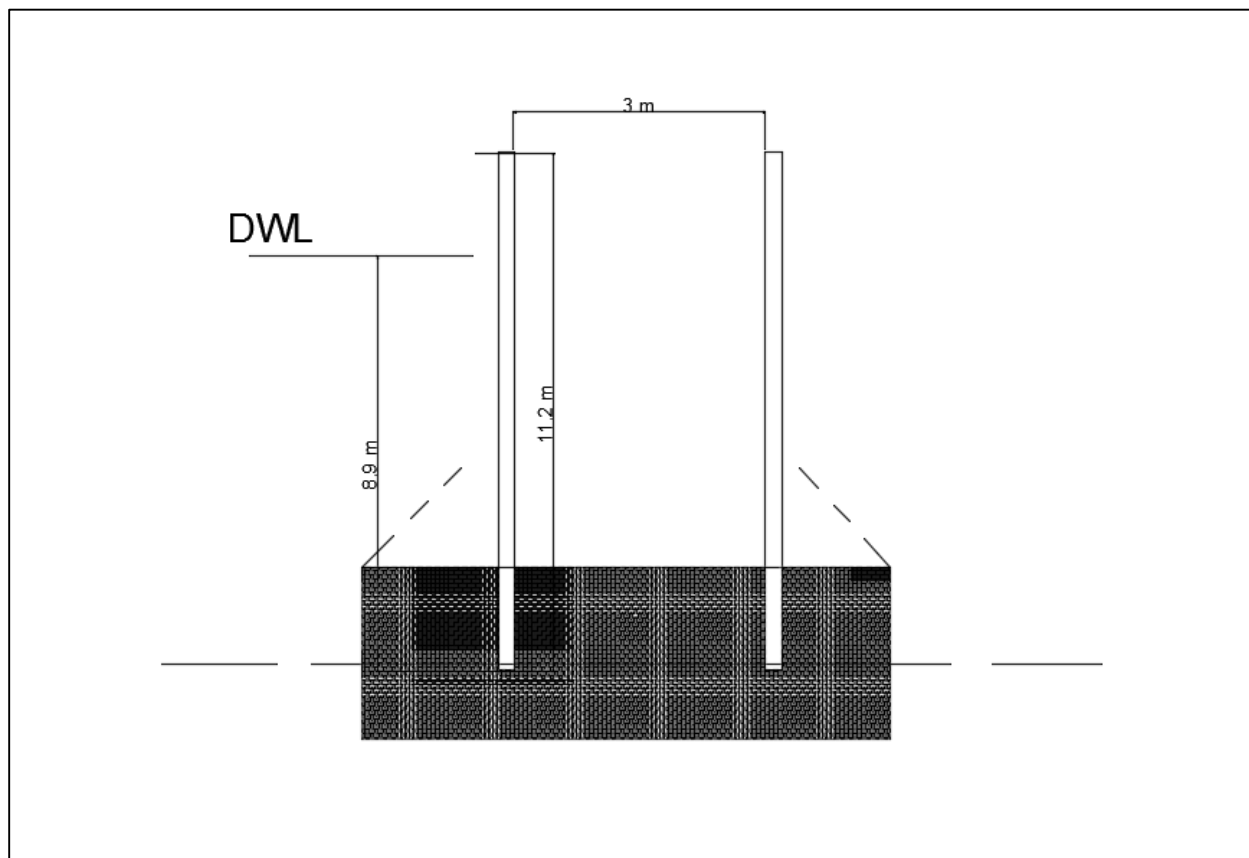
Piled bamboo wall supported by wooden or bamboo mats
